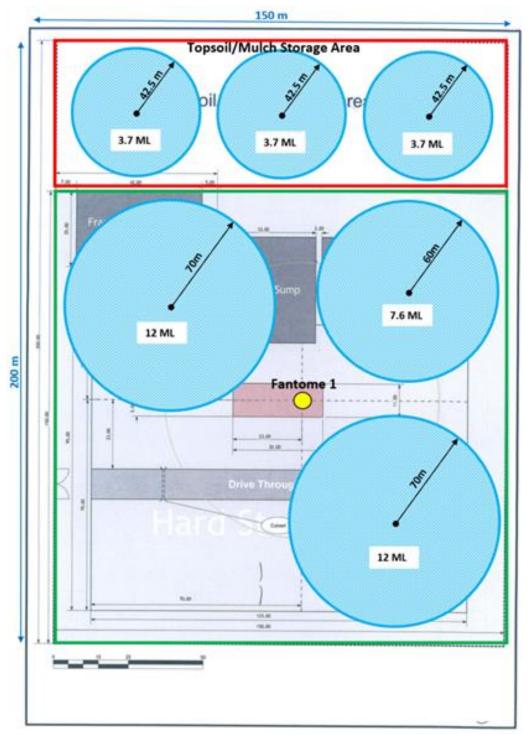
Fantome 1 wellsite layout and proposed water storage arrangement.
